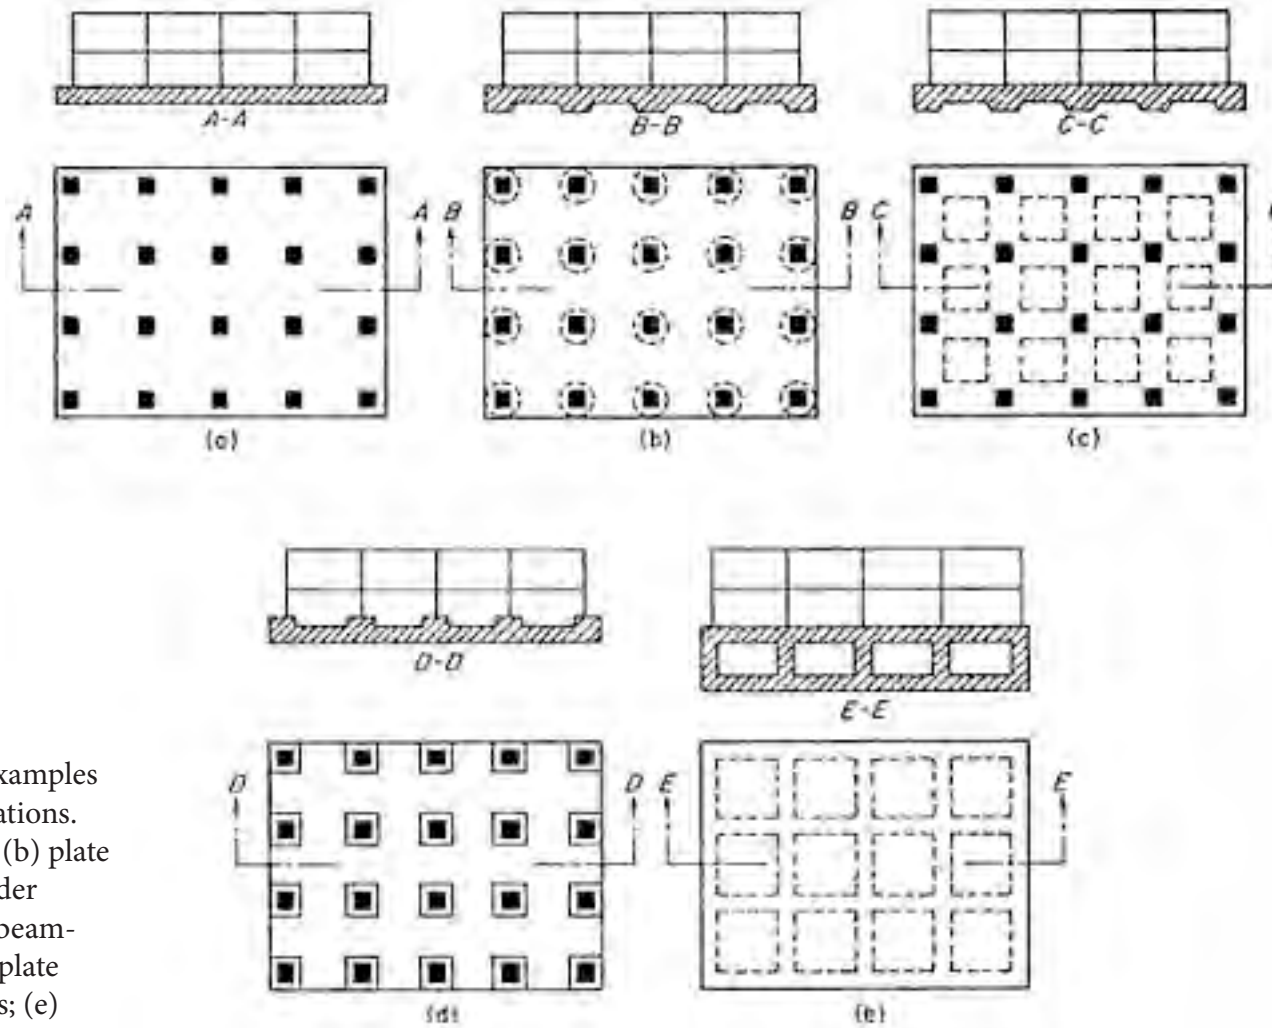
Examples of mat foundations. (a) Flat plate; (b) plate thickened under columns; (c) beam-and-slab; (d) plate with pedestals; (e) basement walls as part of mat.
